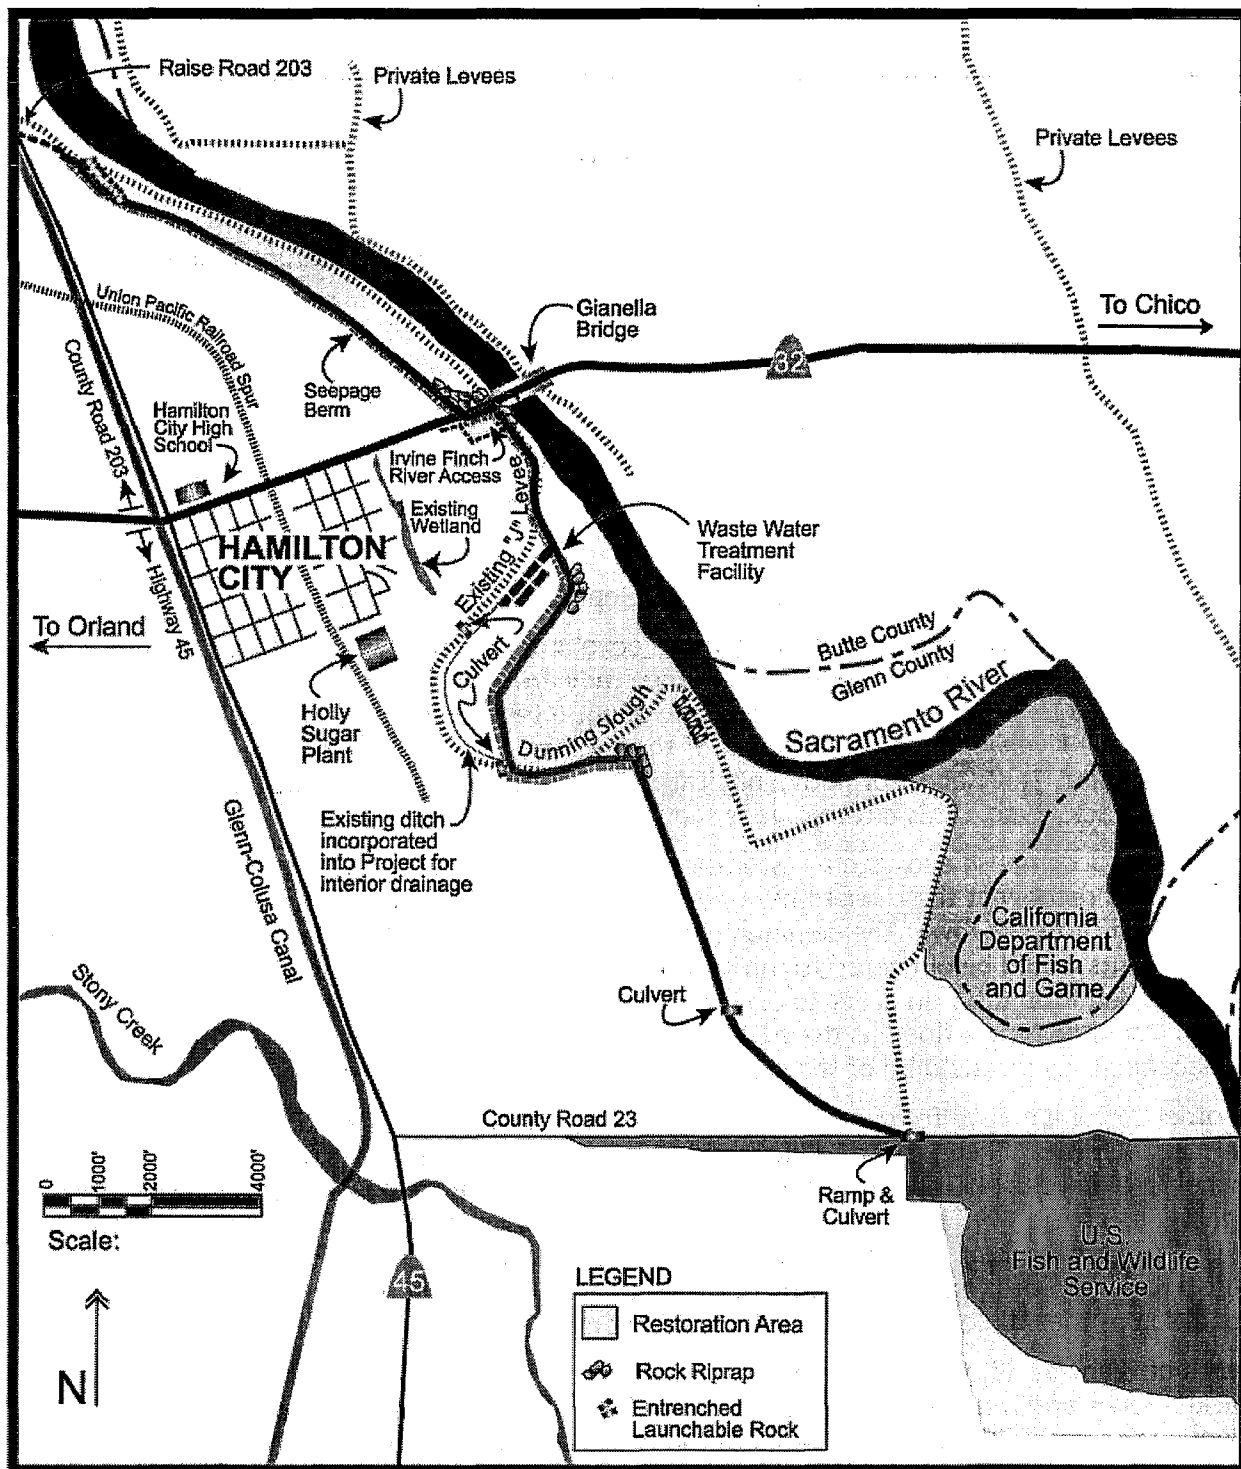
Ecosystem Alternative 1 - Locally Developed Setback Levee
